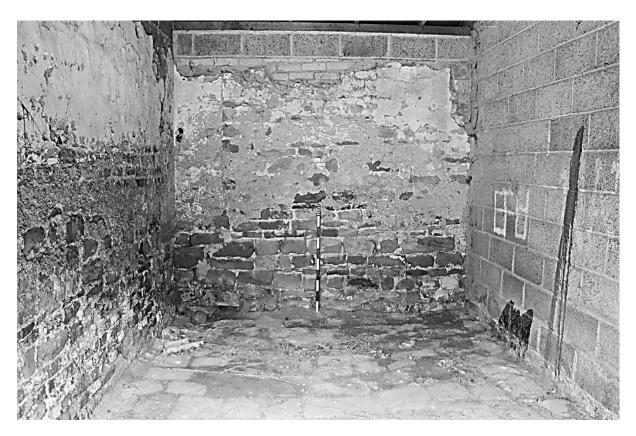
Farm Building 1 South: Room 1.4 (Film 1/28). Facing East.
